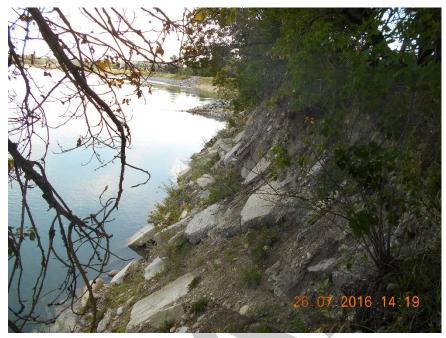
Looking south. Eroded river bank of Site 1 and concrete debris.
